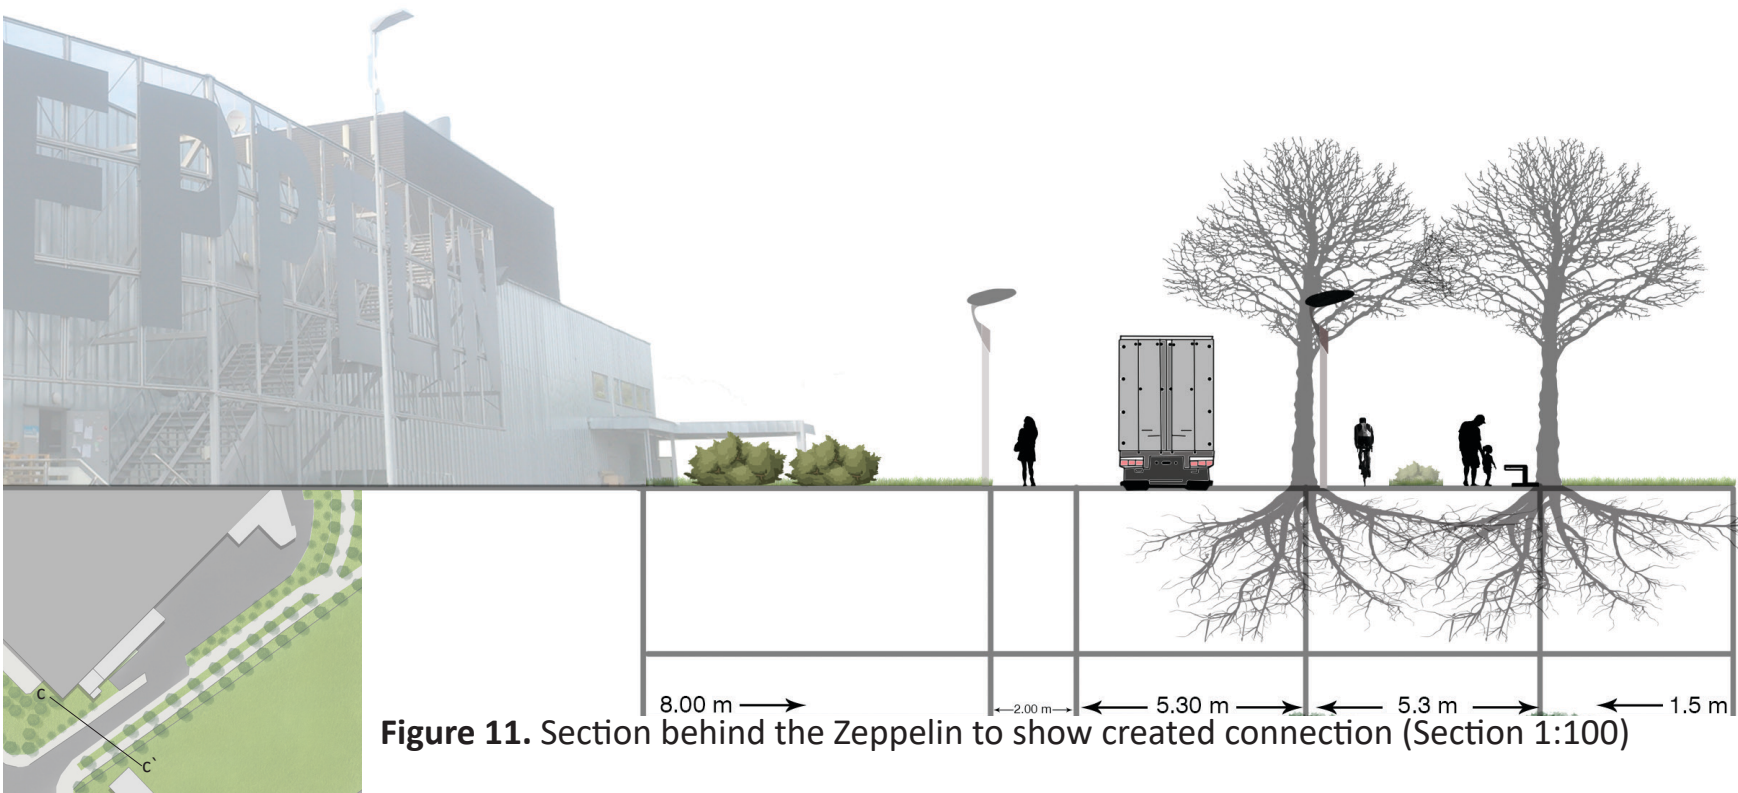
Section behind the Zeppelin to show created connection (Section 1:100)
